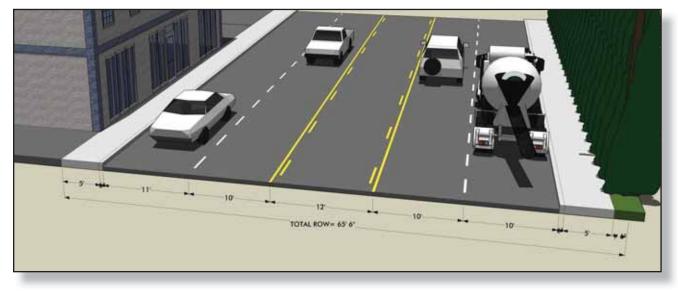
Typical Section from Sevierville Road to Lamar Alexander Parkway
